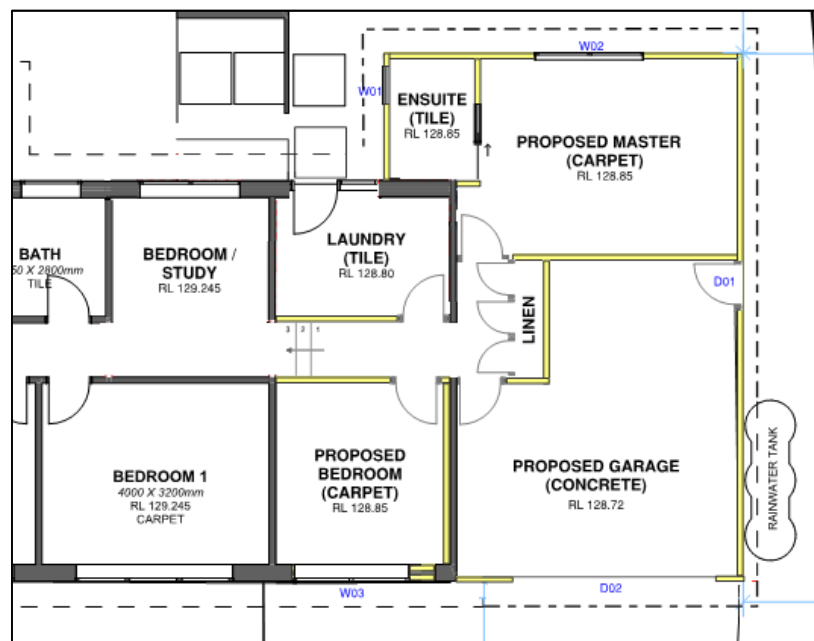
Proposed Updated Ground Floor Plan (Excerpt DA04 July 2019 - NTS)
